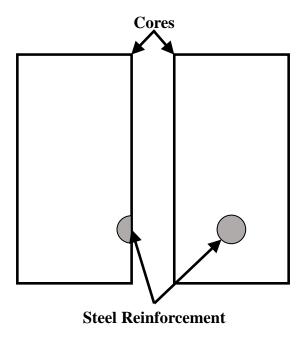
Example of When Strength Correction Factor for One Reinforcing Bar Should
